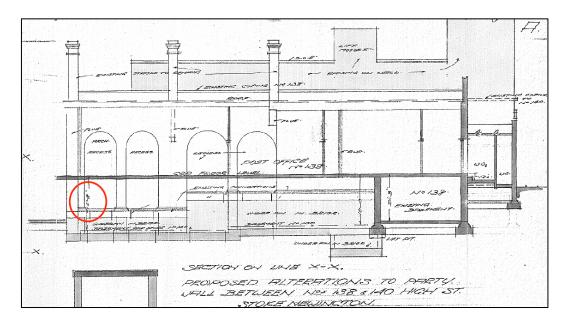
Drawing showing proposed alterations to party wall between Nos. 138 and 140 High Street Stoke Newington (1938) (Reproduced by courtesy of the client)
